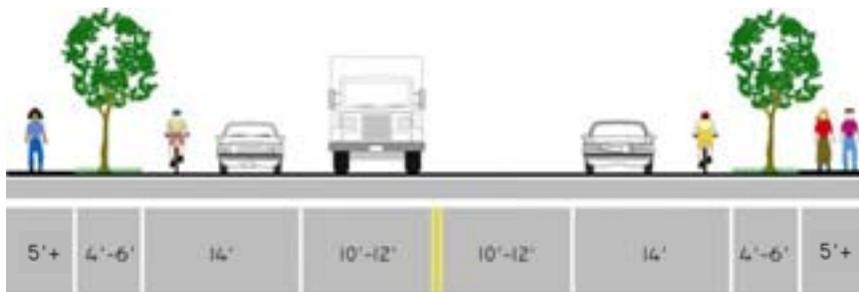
Wide Outside Curb Lane (left) and Paved Shoulder (above)
